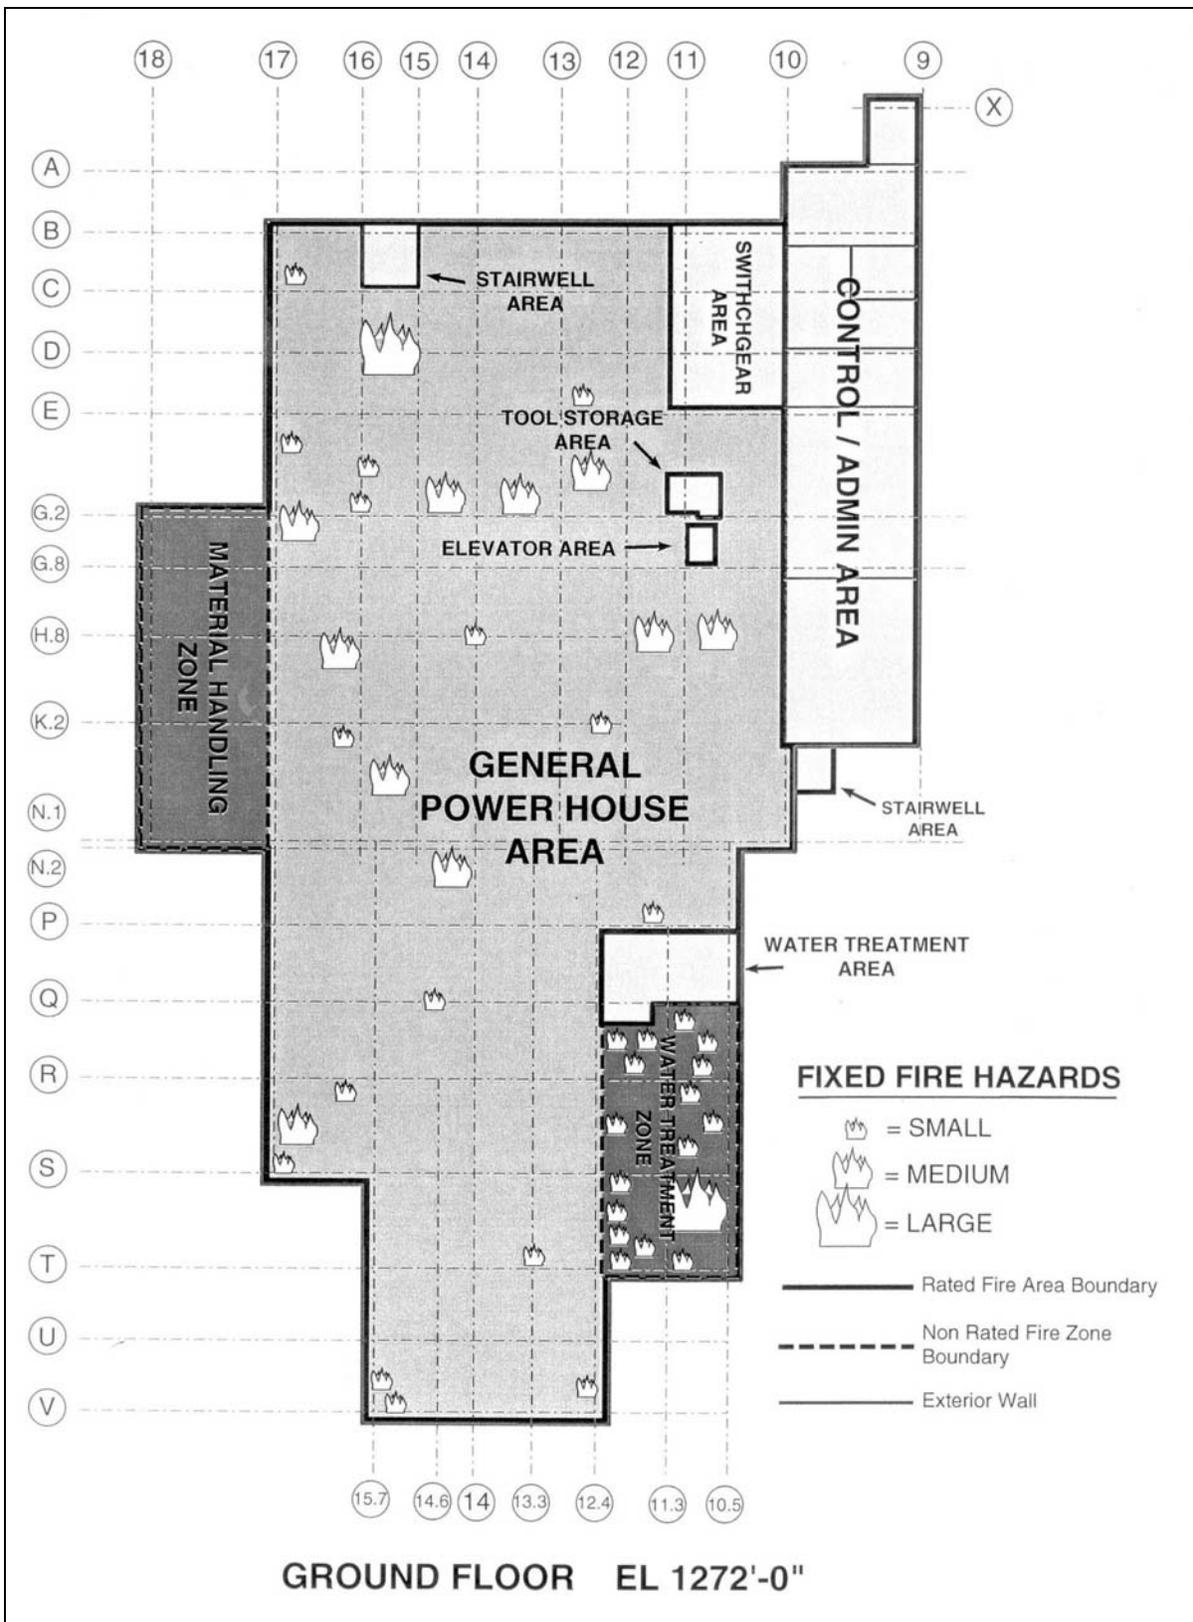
Fixed Fire Hazards on Ground Floor of Healy Power Plant.
